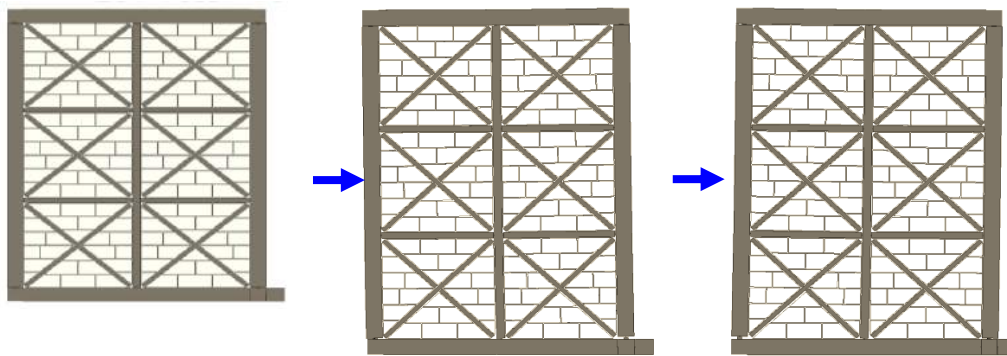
Deformation of wall section under (arbitrary) in-plane dynamic loading.
